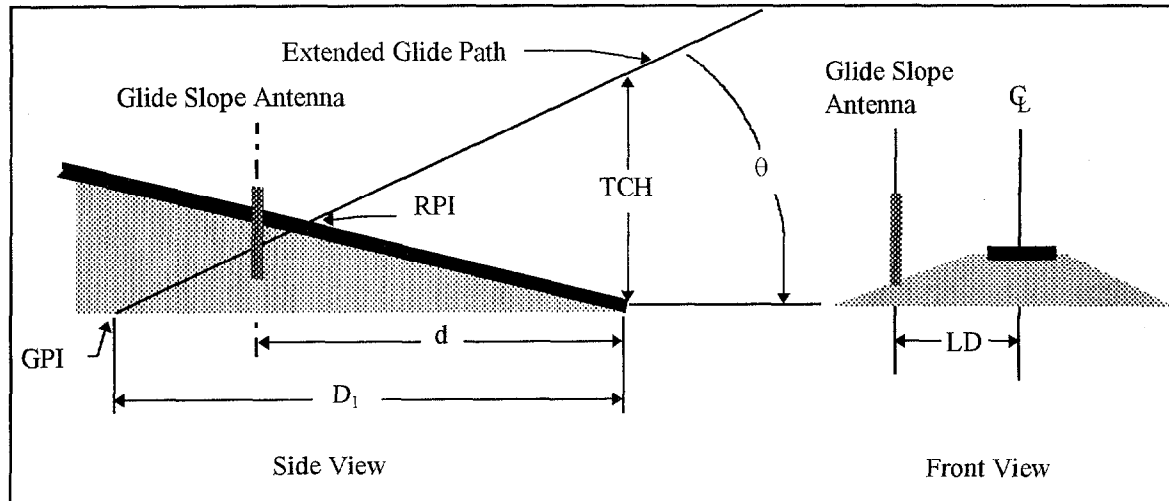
GLIDE SLOPE SITE WITH LONGITUDINAL AND LATERAL SLOPE
